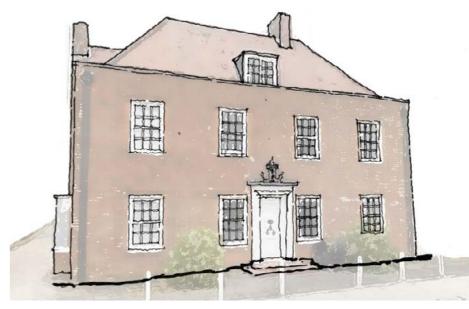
REGULAR ARRANGEMENT OF WINDOWS
